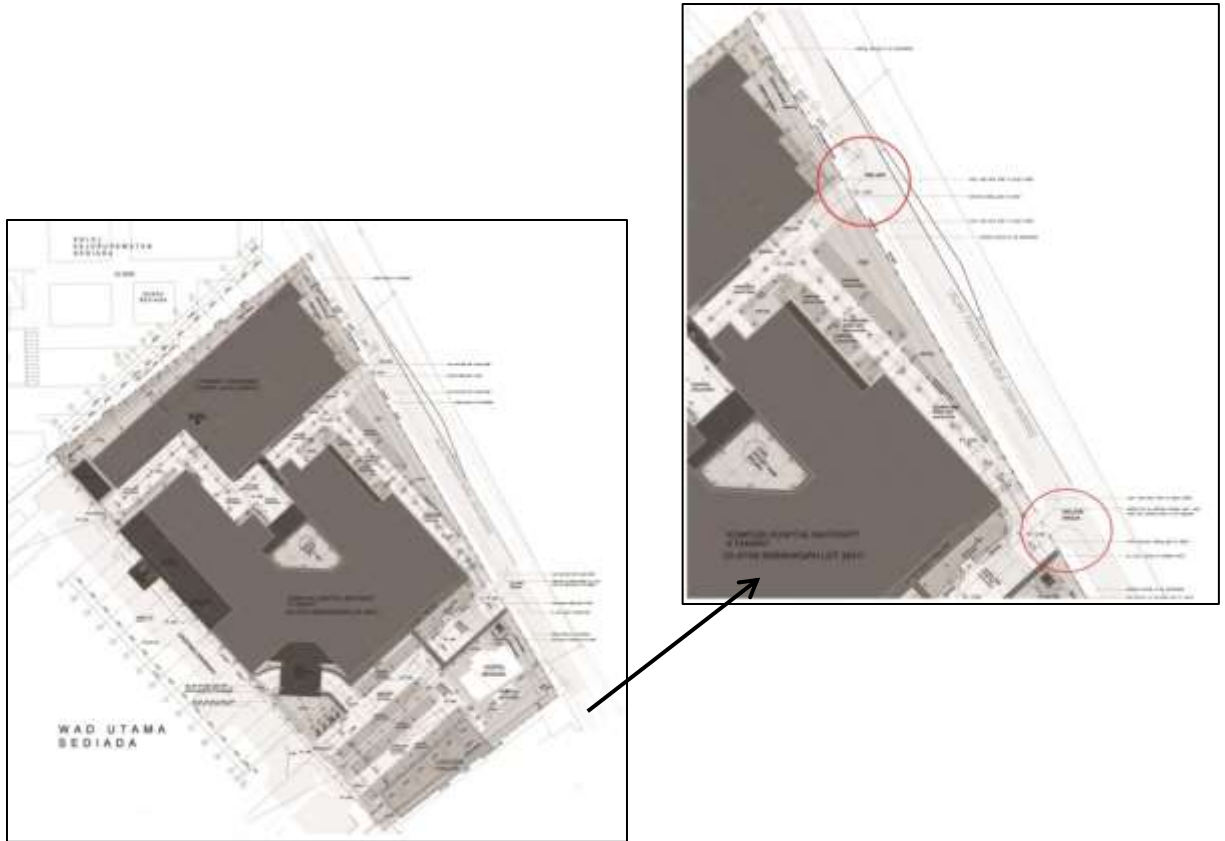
Old Site Plan with Two Entrance Ways
